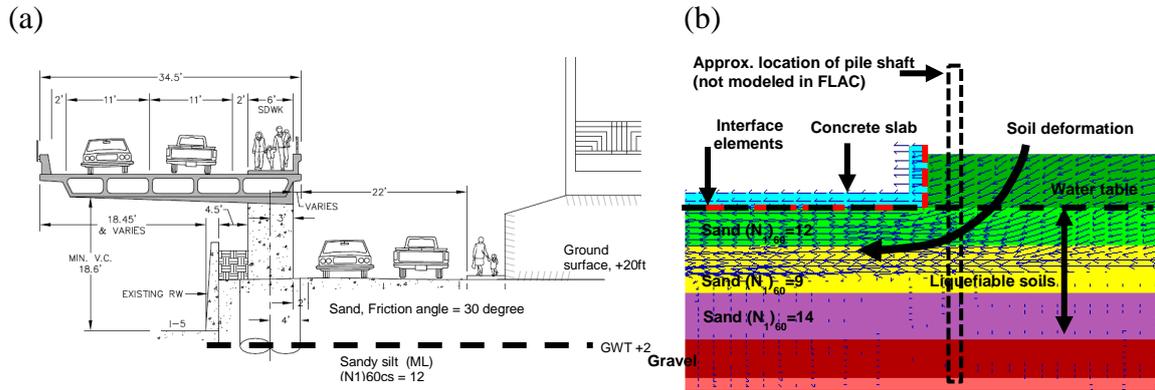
(a) Schematic cross section of riverfront bridge ramp, (b) FLAC model.
